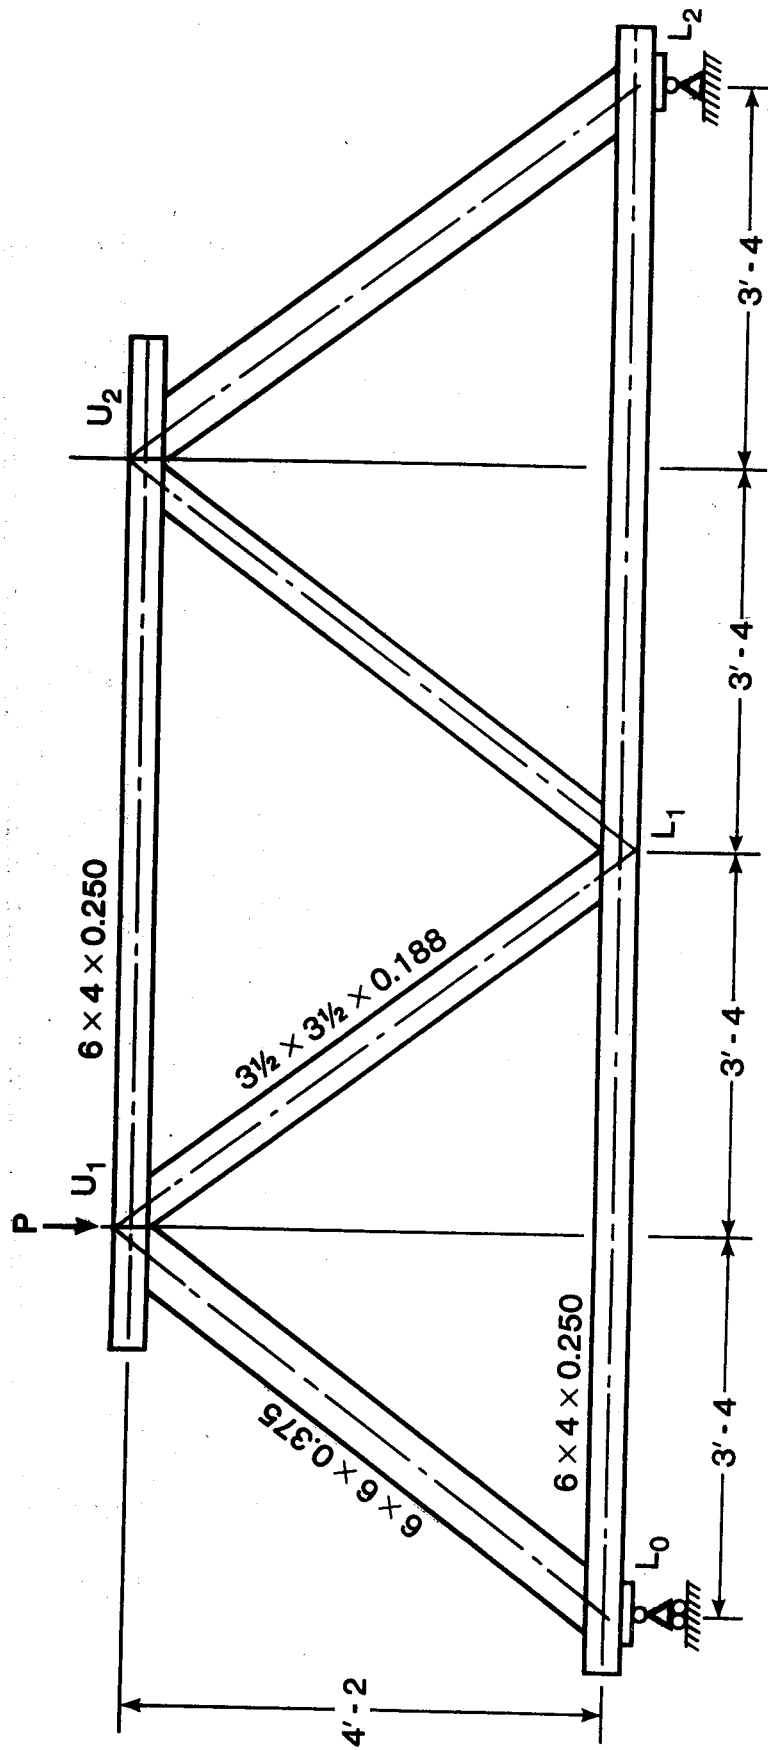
Gap Joint Truss Specimen Layout (Series 3)
